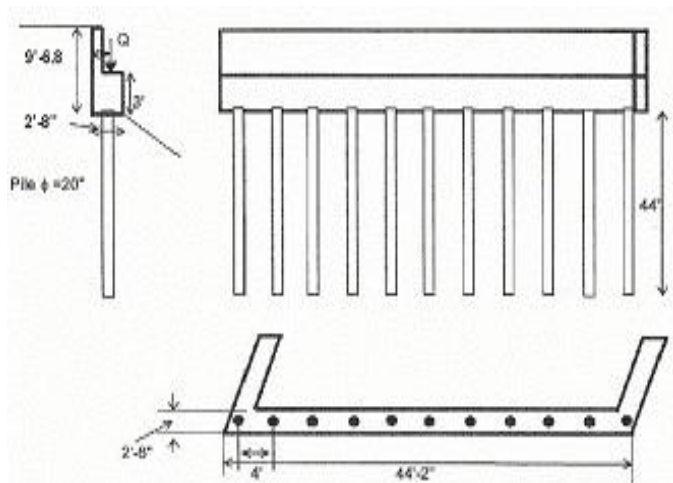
Old St. Francis River Pile Layout – Bridge Abutment
